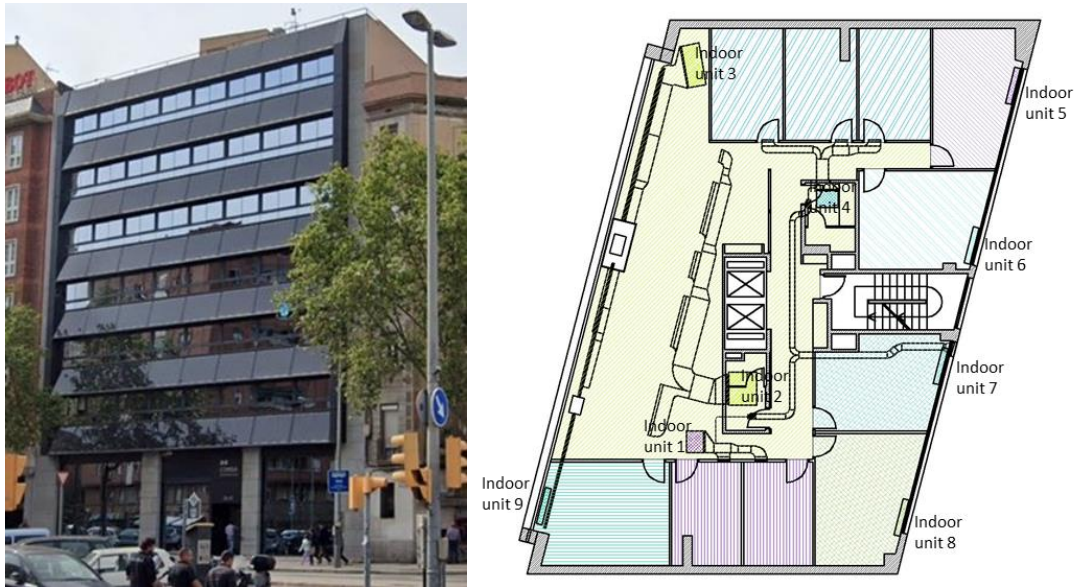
The exterior view of the commercial building and the layout of indoor HVAC units. It shows 9 indoor HVAC units with their corresponding supply ducts and served zones in the 4<sup>th</sup> floor.
